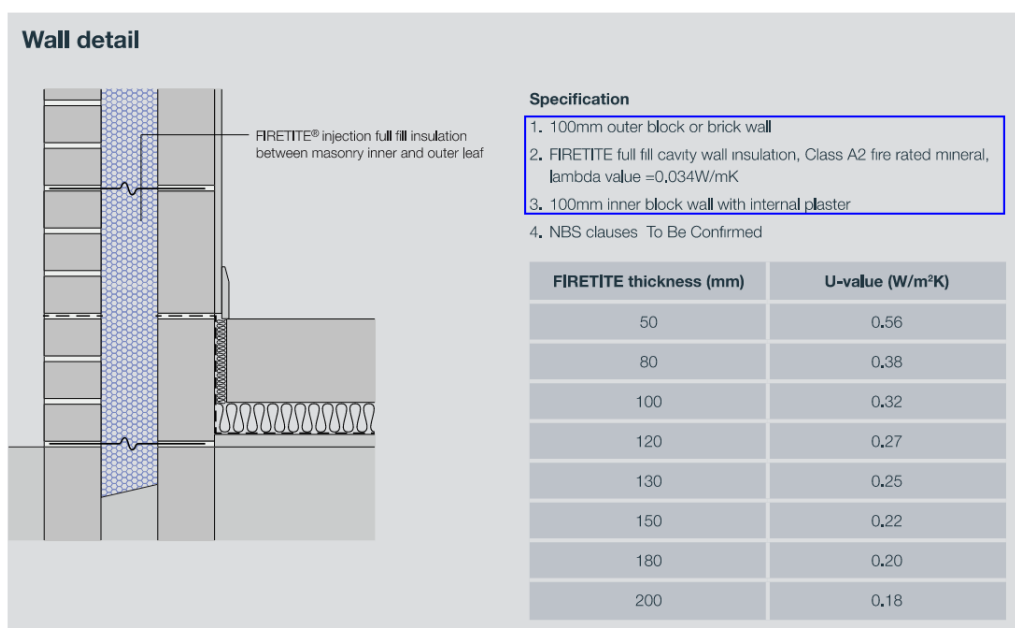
(shows outer and inner block walls with FIRETITE full fill cavity wall insulation)
